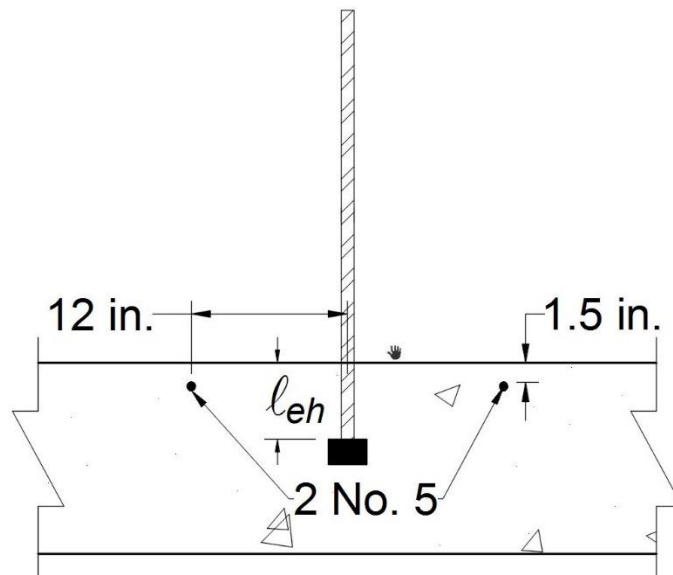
Cross-section view of shallow embedment specimen with 2 No. 5 bars as flexural reinforcement.
